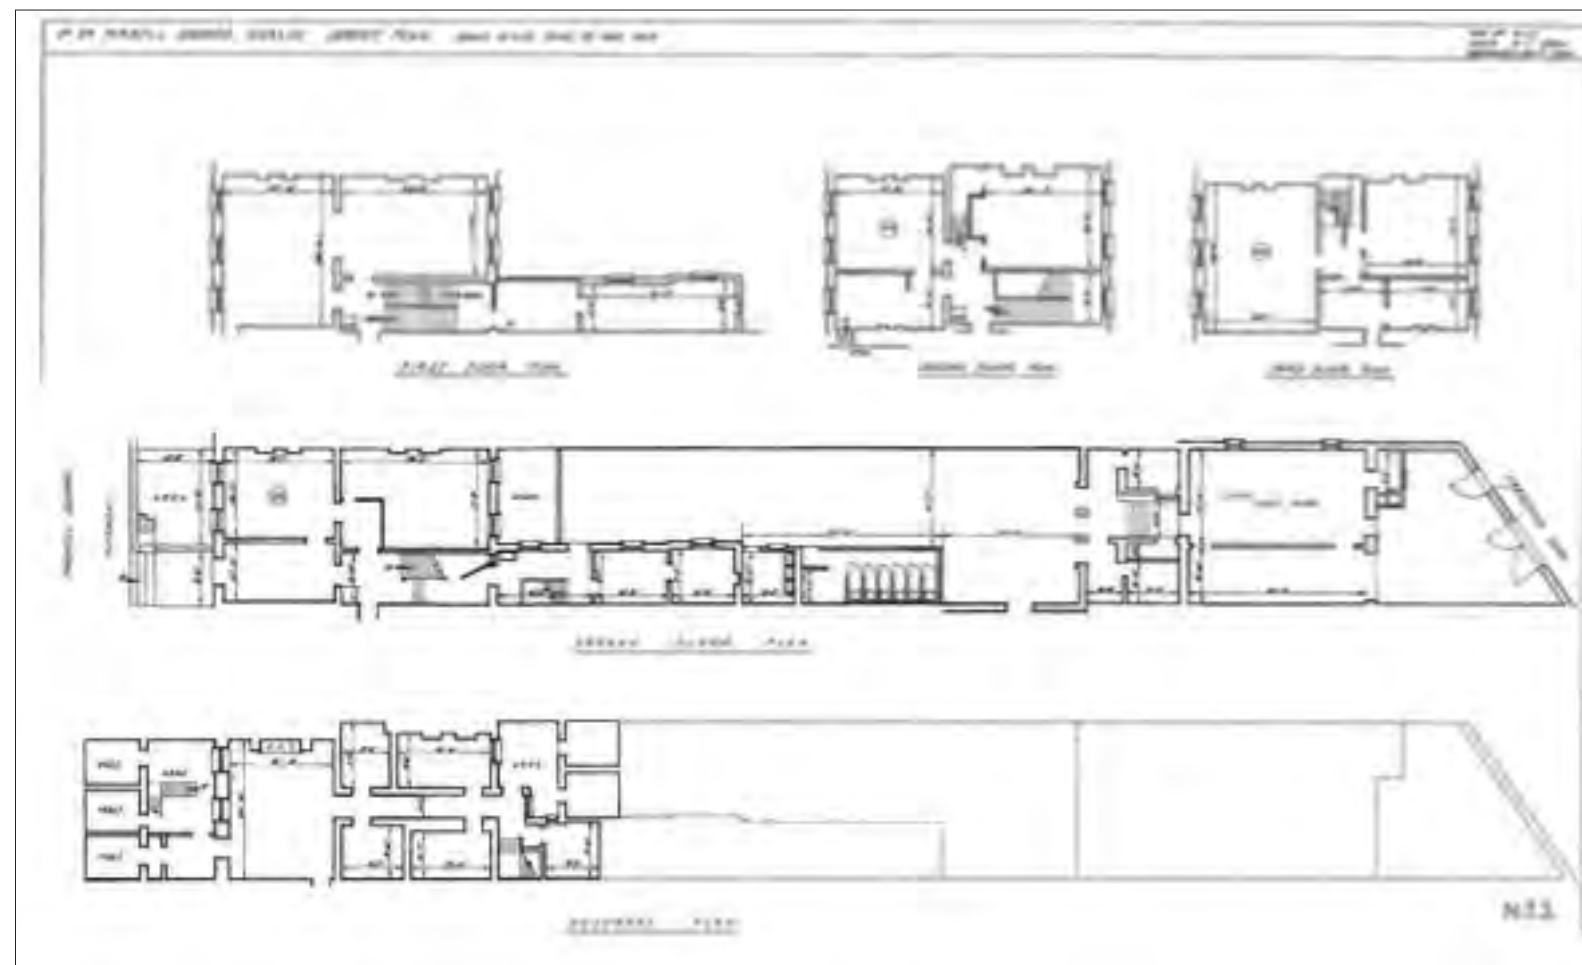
No 24: Plan form substantially intact. Connection in party wall to No 23 in place. Lobby partition in rear ground floor room with off-centre door opening (may have been altered). Extensive return structure to the rear with small open basement area to rear.
